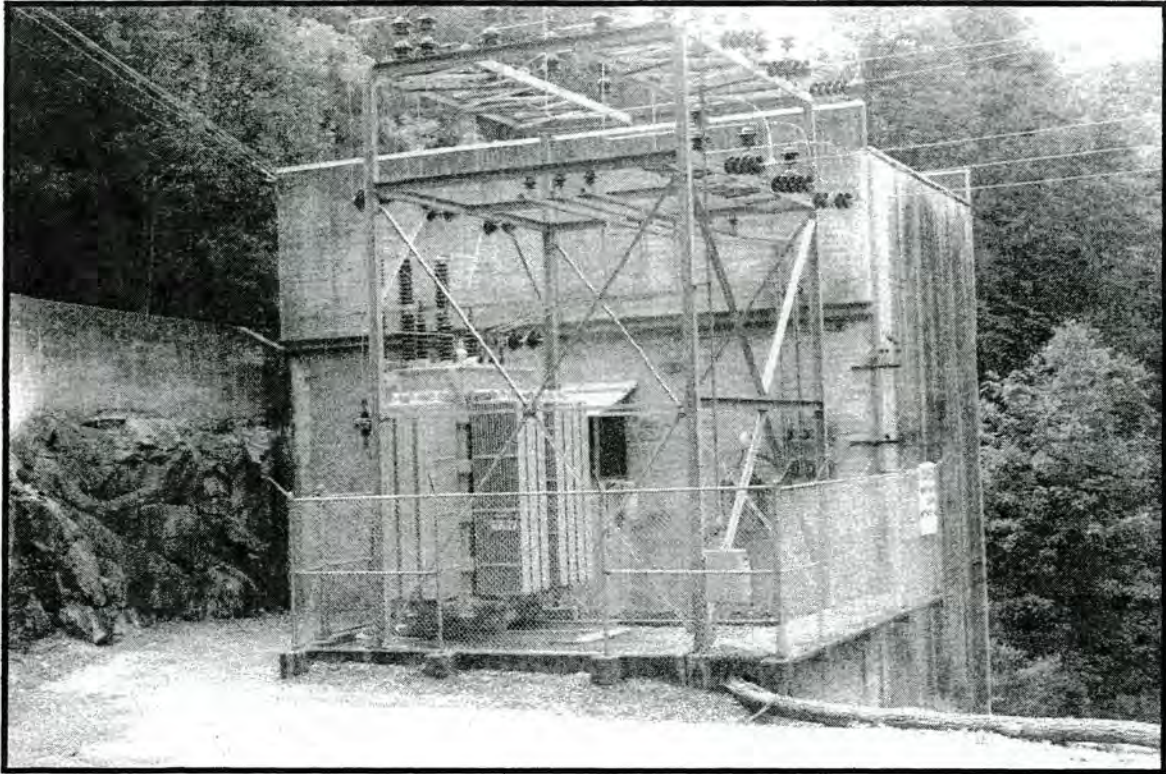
The Bear Creek Powerhouse, south and east facades.
